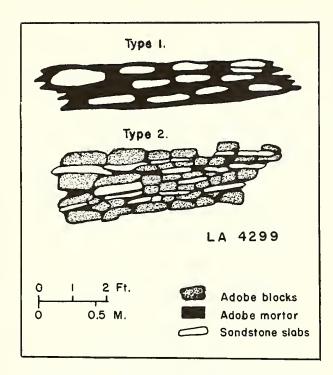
Details of wall construction, LA 4299, a, Type 1 masonry used in Rooms 1 and 3; b, Type 2 masonry used in Room 2.
